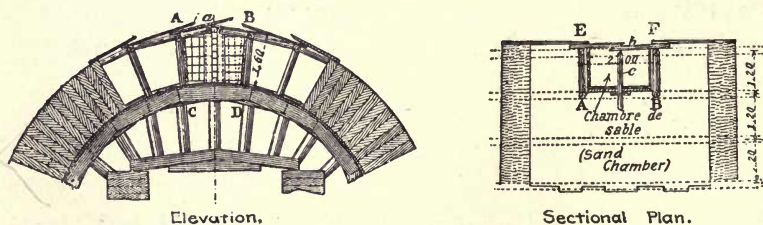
Meudon Tunnel: Detail Showing the Construction of a "Sand-chamber."
